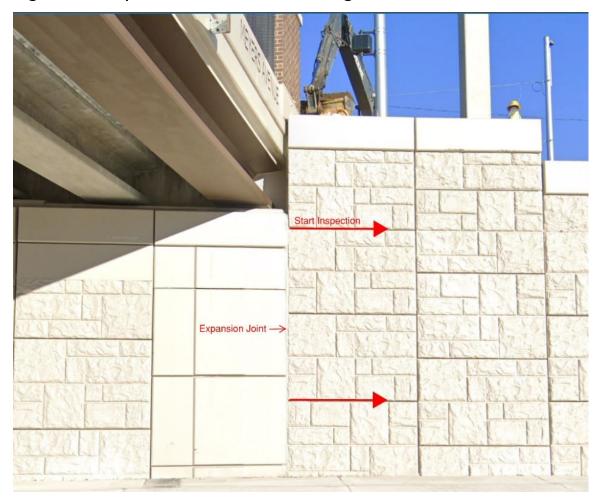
Inspection Limits for Retaining Walls
